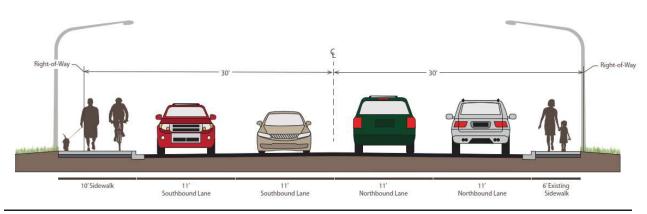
Proposed Typical Section – 13th Street to 17th Street
